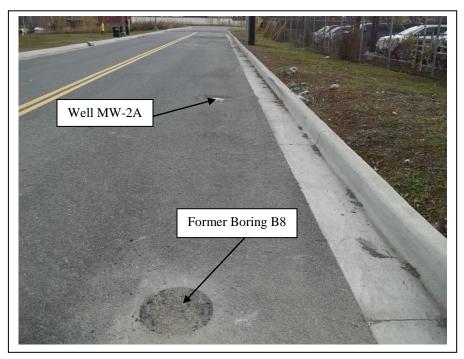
Asphalt cold-patches were used to restore the ground surface at Borings B7 and B8 which were advanced in a road; looking southeast. (October 9, 2014)
